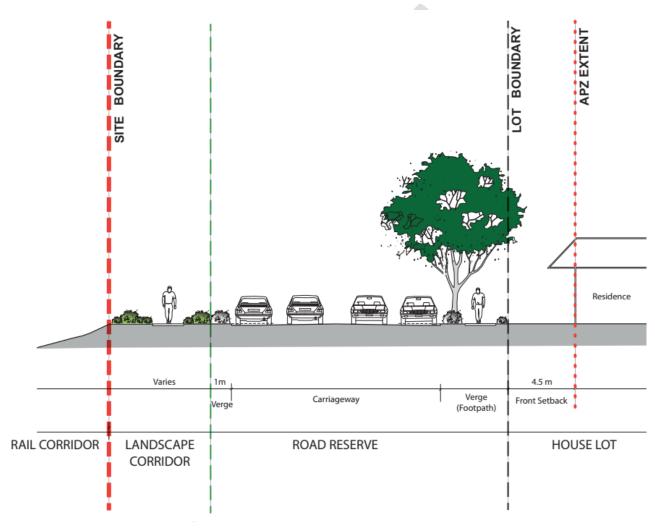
Indicative Perimeter Road Cross Sections (Landscape Corridor)
